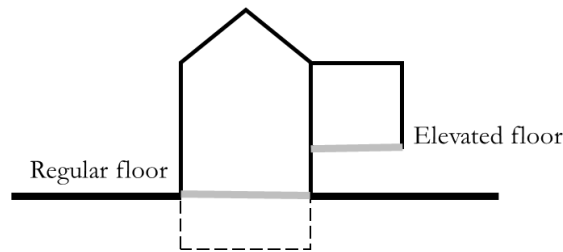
Floor elements are assumed to be adjacent to an unheated basement unless their constituting “Building Part” is associated with an elevation above ground level.
